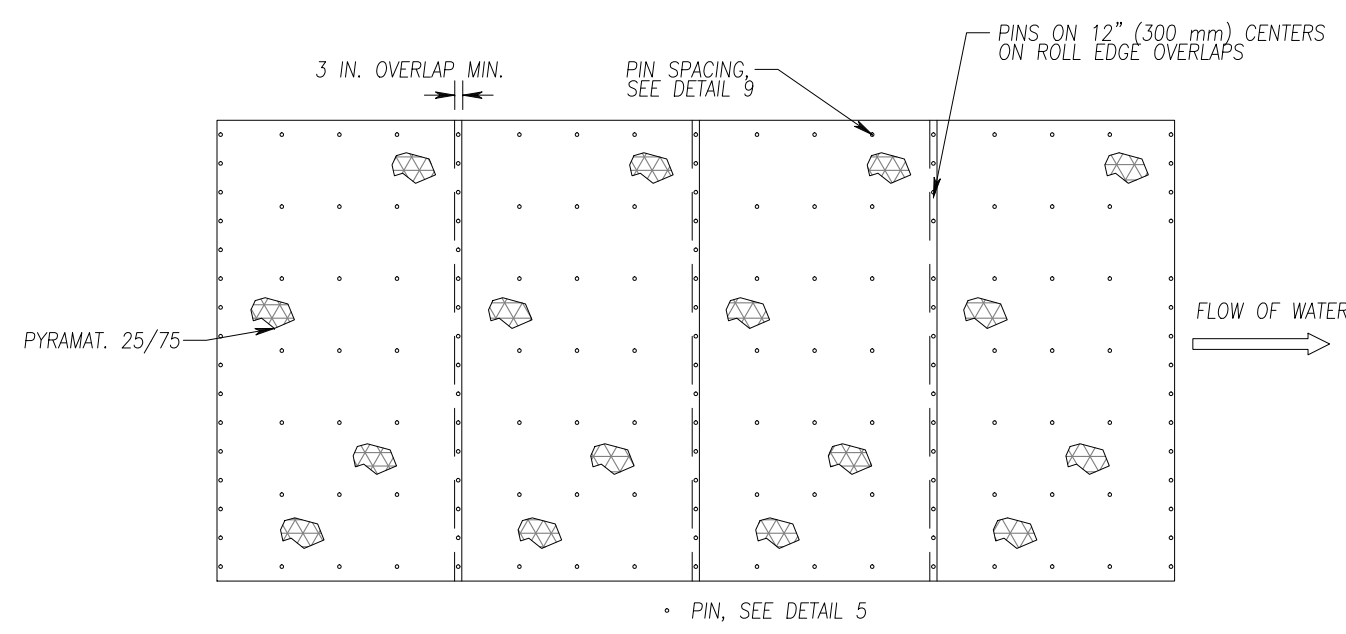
OVERLAP AT ROLL END DETAIL PLAN VIEW
